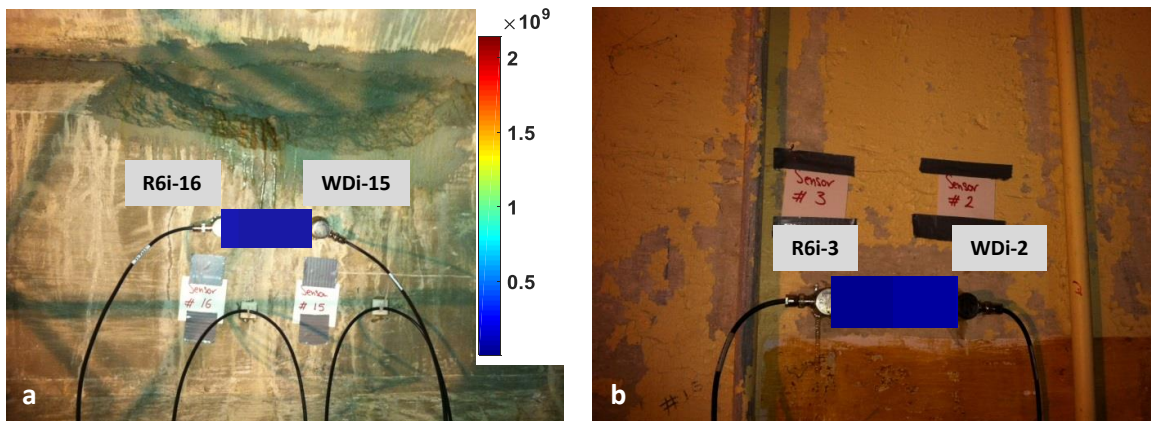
Signal strength contour plot: (a) horizontal beam location, and (b) control location.
